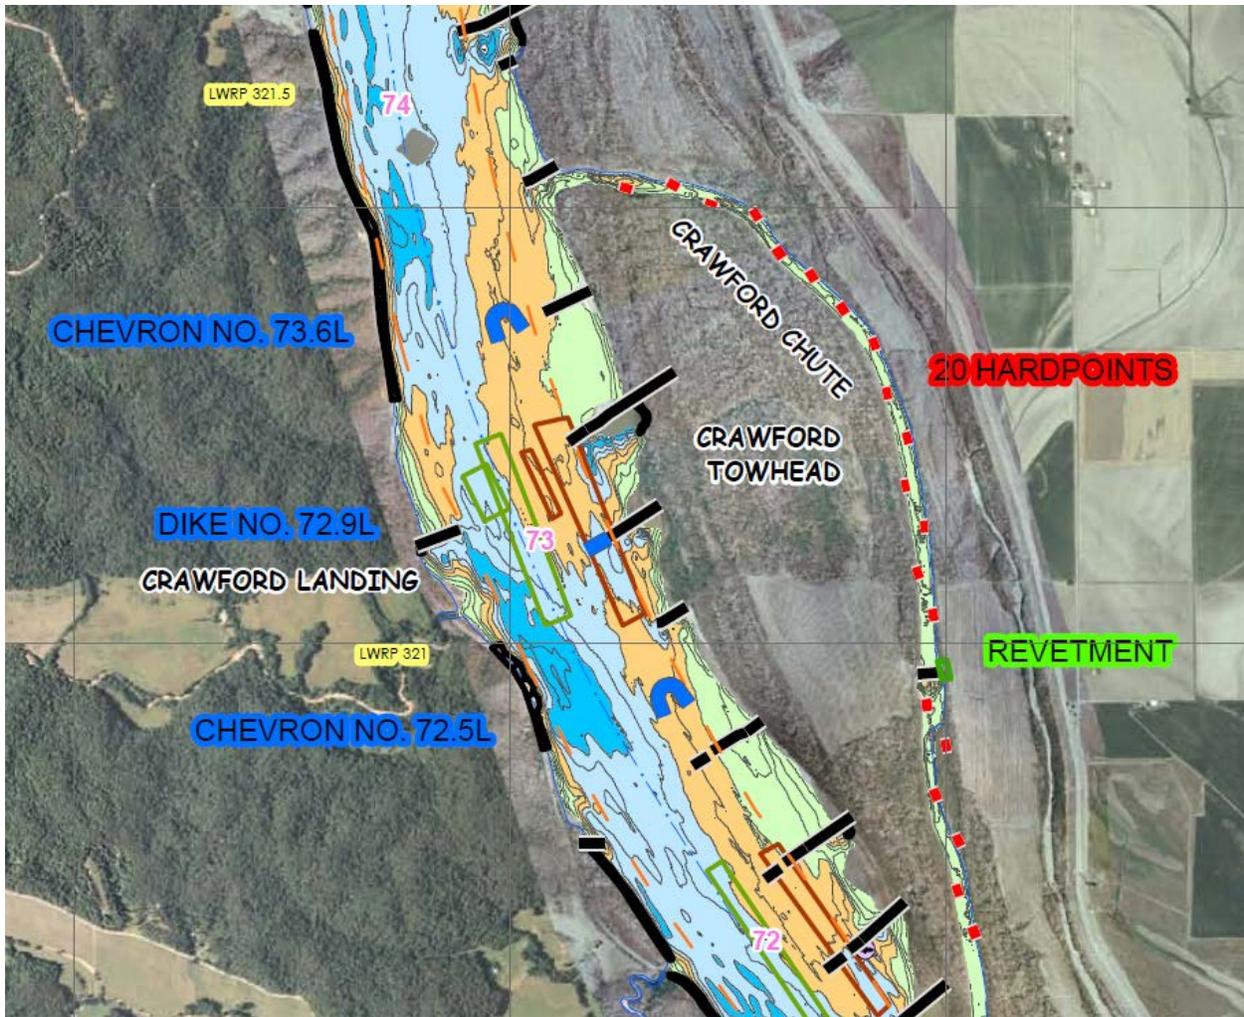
Proposed Crawford Towhead Regulating Works Structures.
